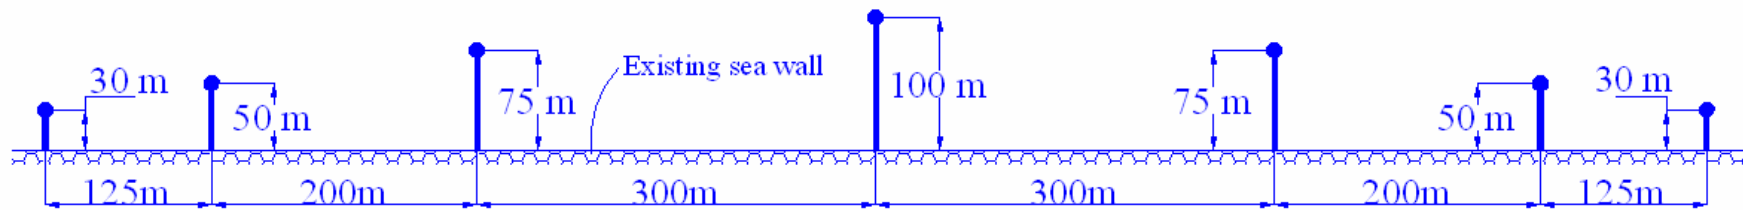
Proposed layout of transition groin field at Beemapally
